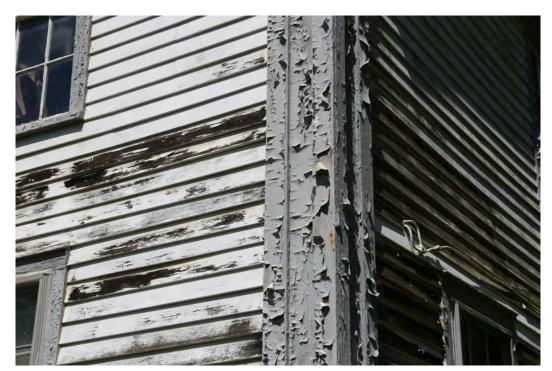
Detail of southeast corner showing failing paint finishes on clapboards, corner boards and window frames.
